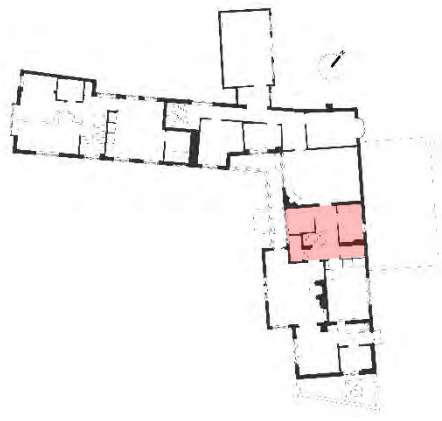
First floor staircase landing. This area has been heavily altered and the existing layout is not original.
